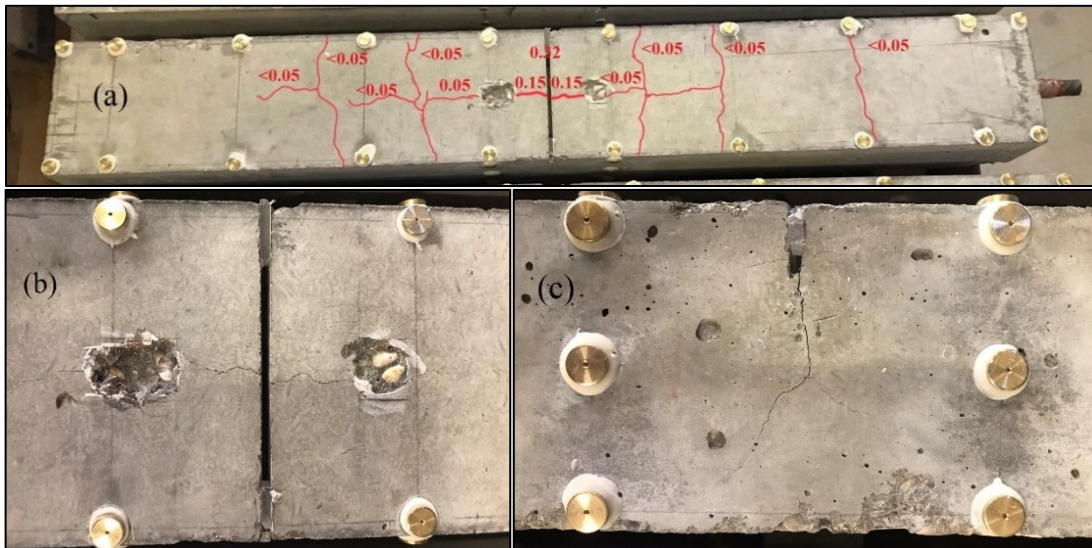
CN2 cracks configuration: (a) Mapping, (b) Main crack top view, (c) Main crack lateral view
